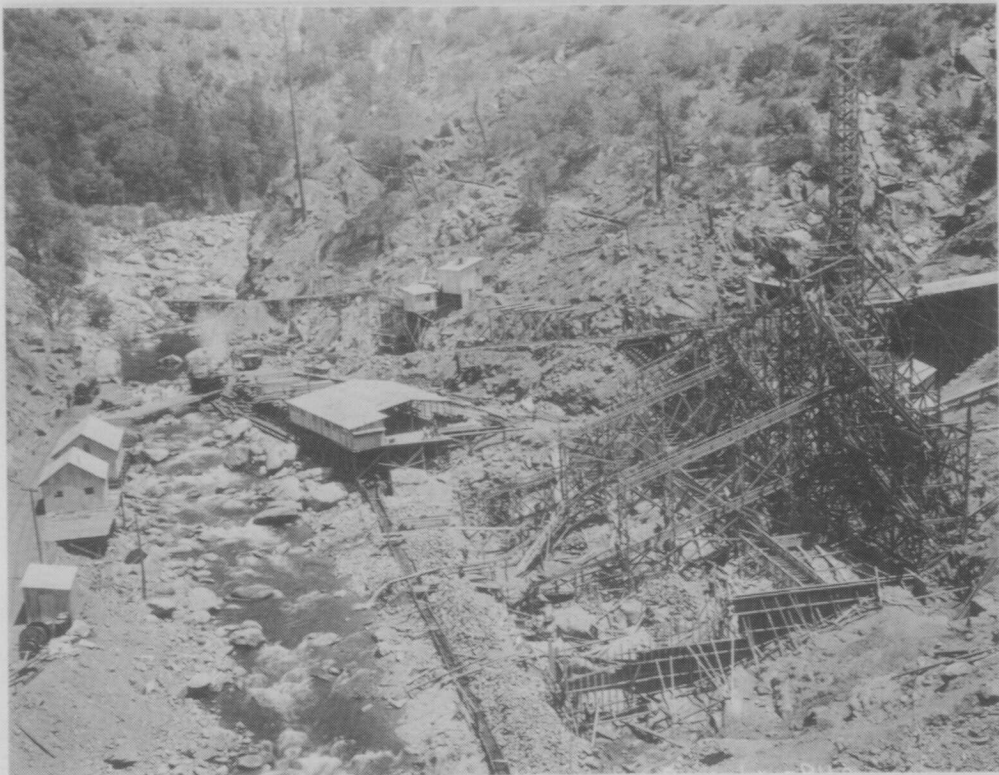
Construction at Powerhouse No. 2, May 1913 (SCE var. [b]:Album 1, No. 411).
